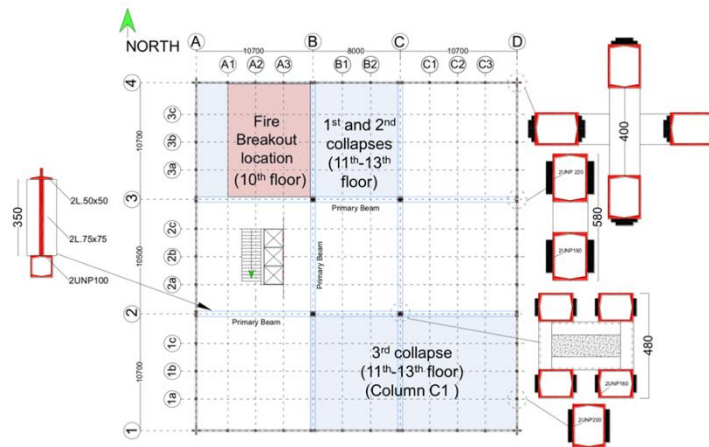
The layout of the Plasco tower and areas of collapse (Shakib et al. (2020))
